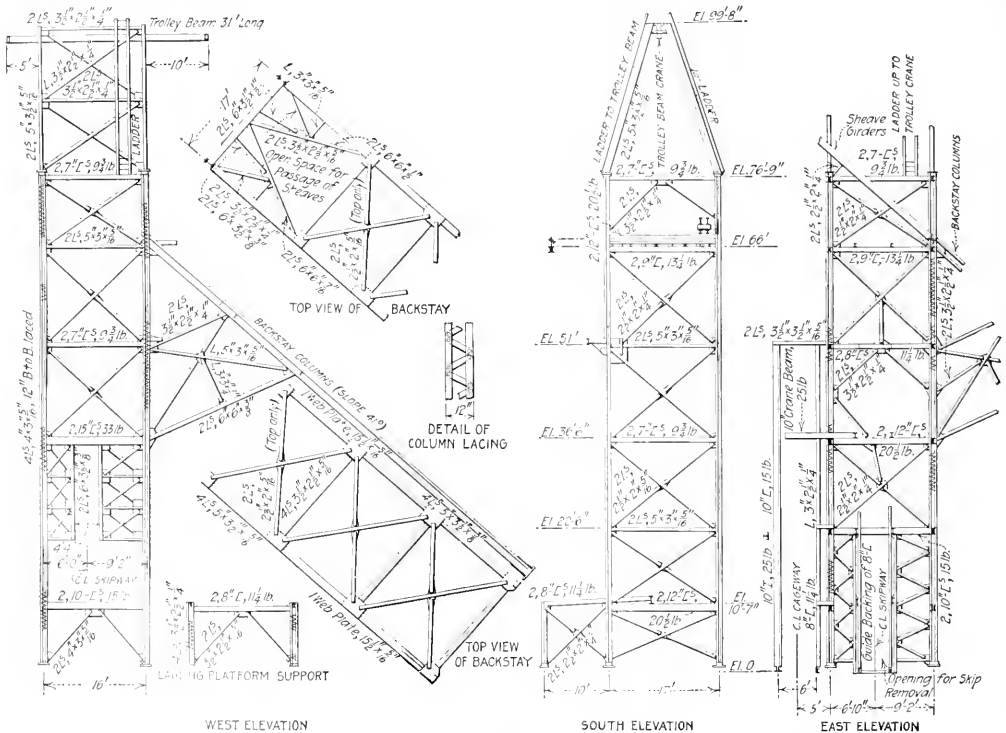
DETAILS OF STEEL HEADFRAME REPLACING WOODEN STRUCTURE AT VULCAN, MICH.
